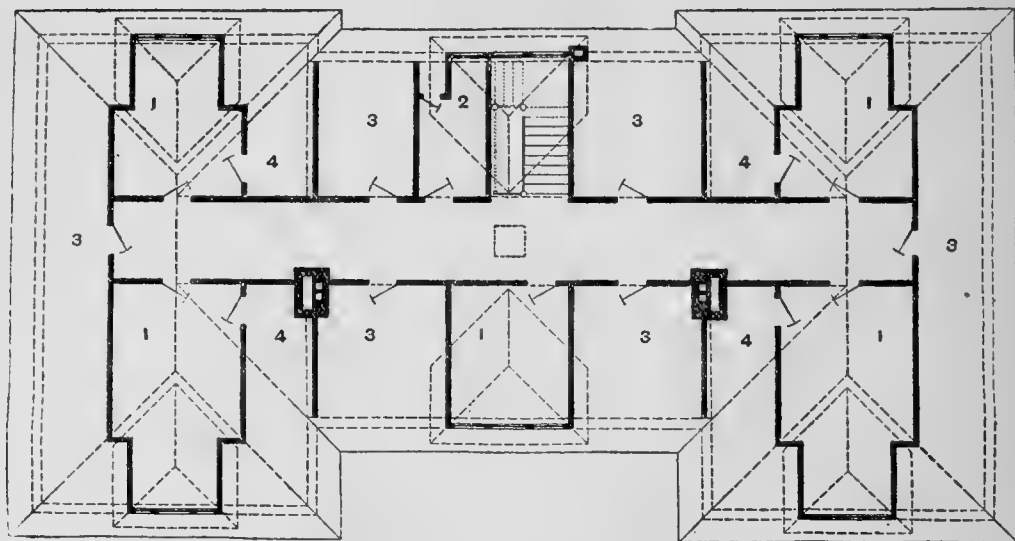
Plan of third floor of laboratory building. 1, Five bed chambers; 2, bathroom; 3, six dark storage chambers; 4, four large closets.
